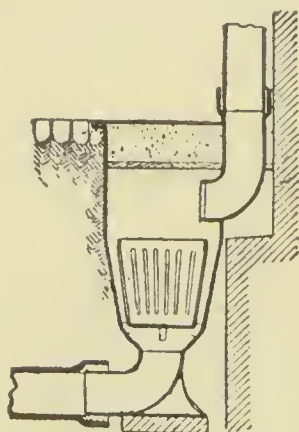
RAIN PIPE IN-LET AT ERFURT.
